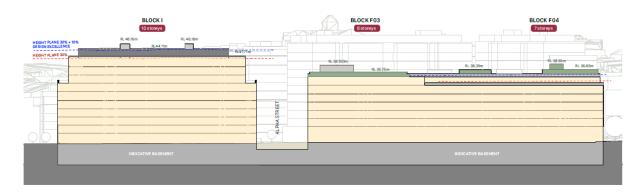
Proposed amended sections - buildings F and I (north-south) fronting Mitchell Road
